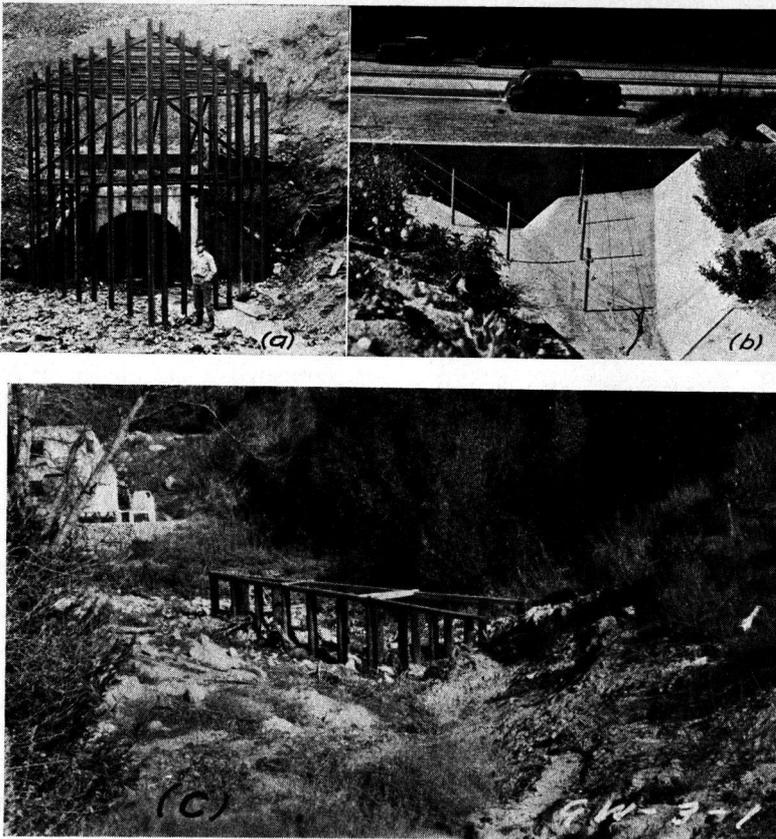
(a) Steel Rail Debris Deflector at Entrance to a Large Concrete Arch Culvert to Deflect Heavy Debris. (b) Wire and Pipe Debris Deflector at Entrance to R. C. P. Culvert to Deflect Light Floating Debris. Note drop-down approach to culvert entrance. (c) Wooden Pile Debris Deflector at Entrance to a Large Culvert for Purpose of Deflecting Bed-Load of Large Boulders and Heavy Floating Debris.
